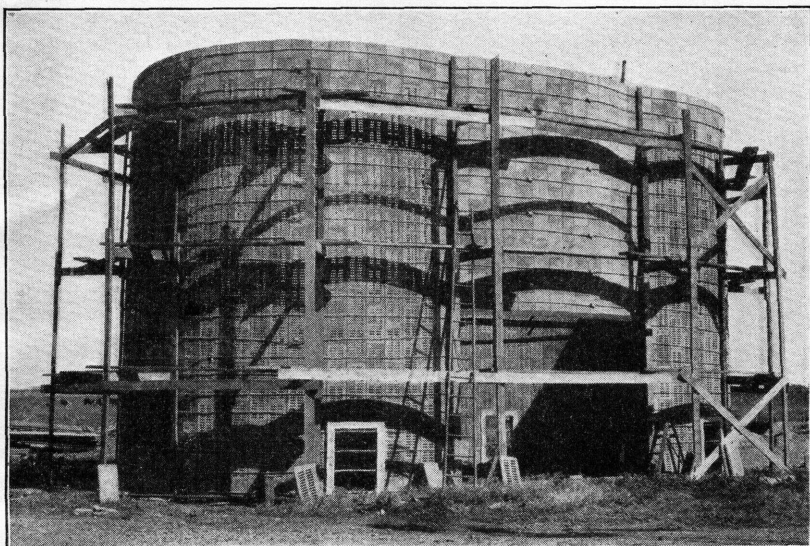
Large concrete-stave crib with central bins, under construction. Hoops are threaded through holes in precast concrete frame for shelling door
